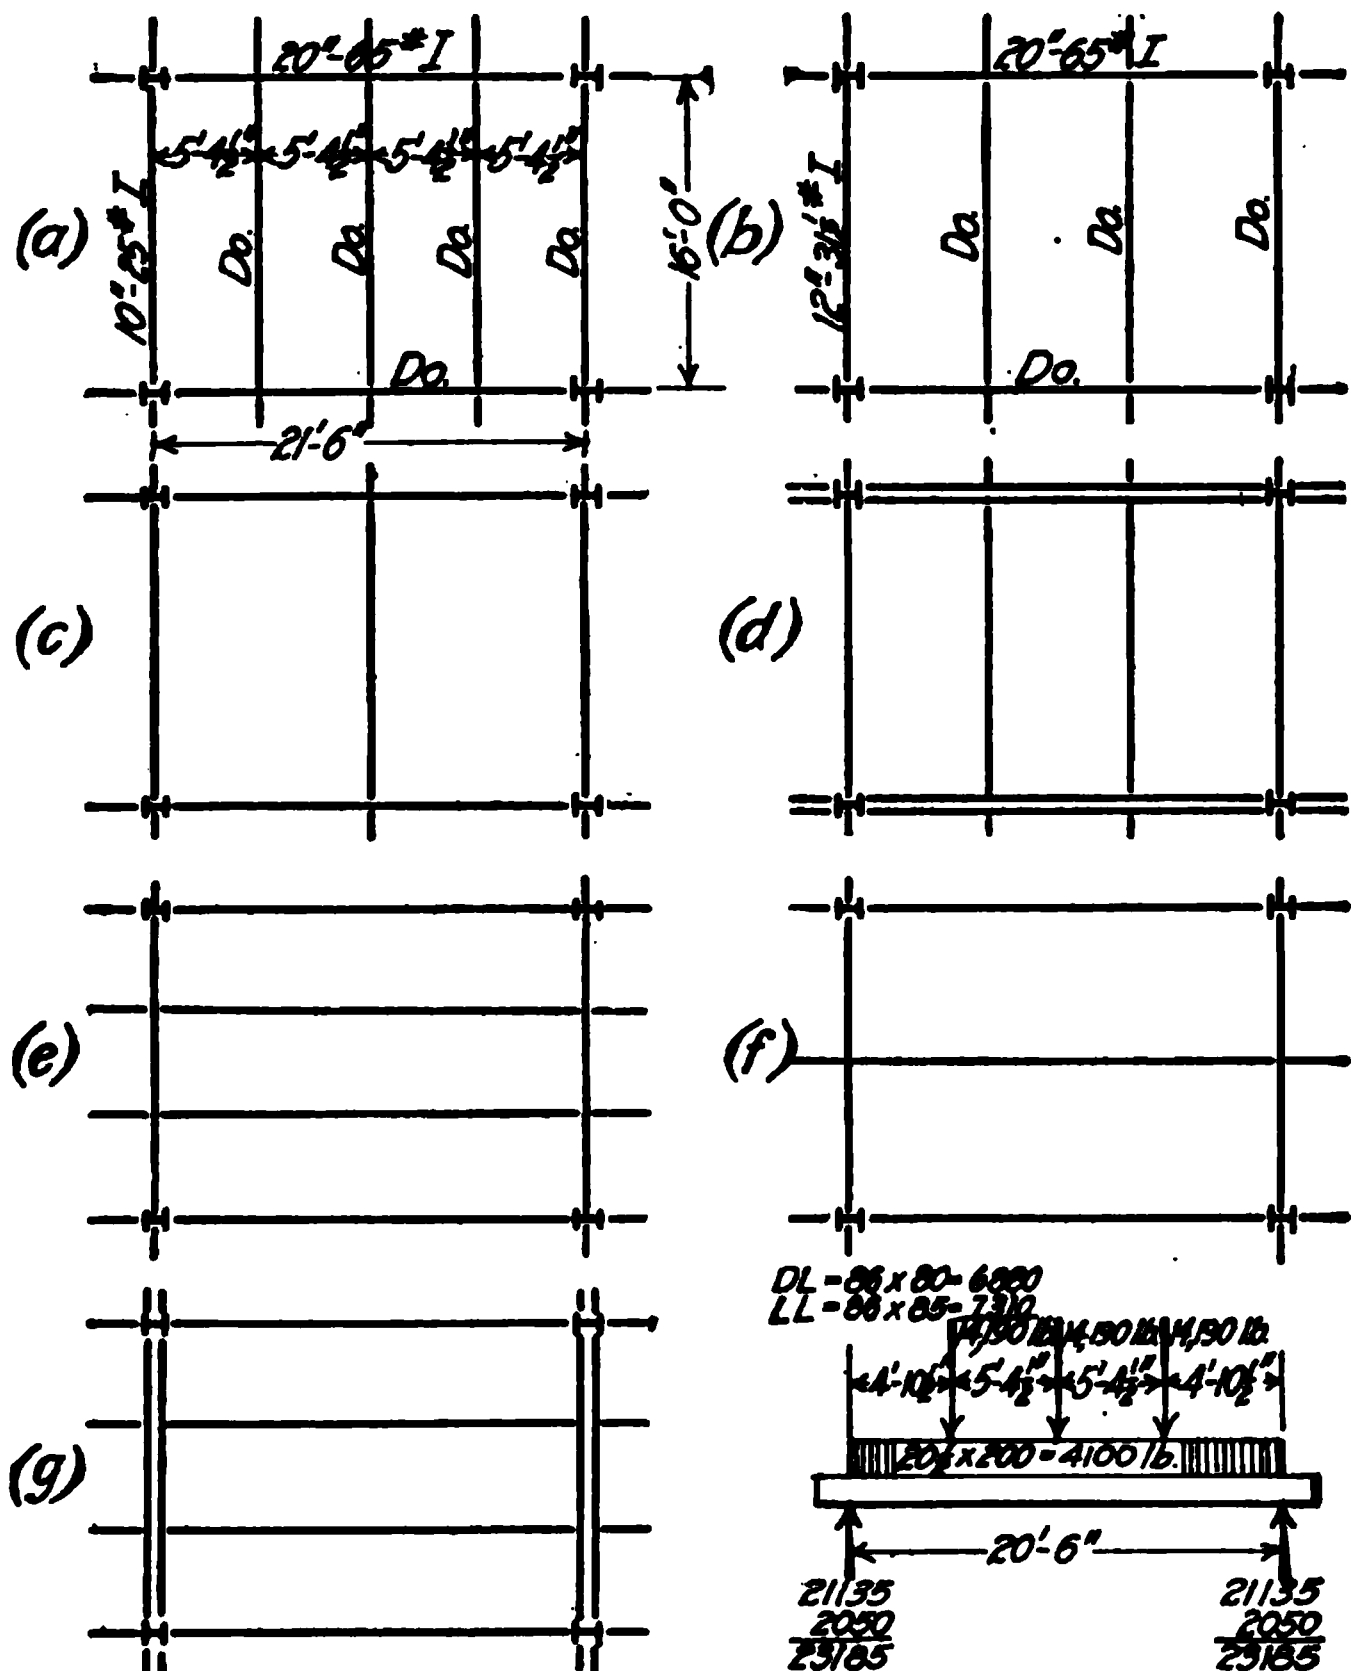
Alternate arrangements of steel joist and girder framing.
